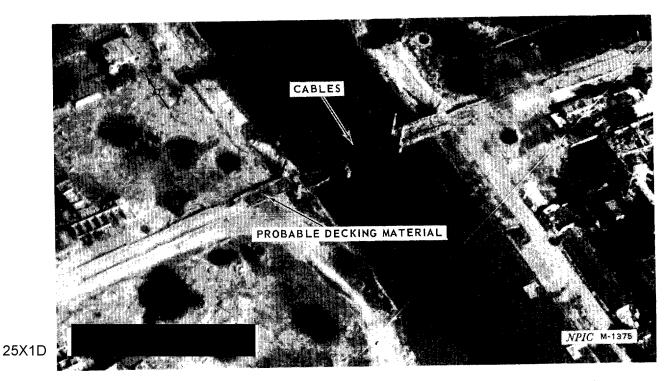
CABLE BRIDGE OVER THE SONG TRAM BAC, HAI PHONG, NORTH VIETNAM
